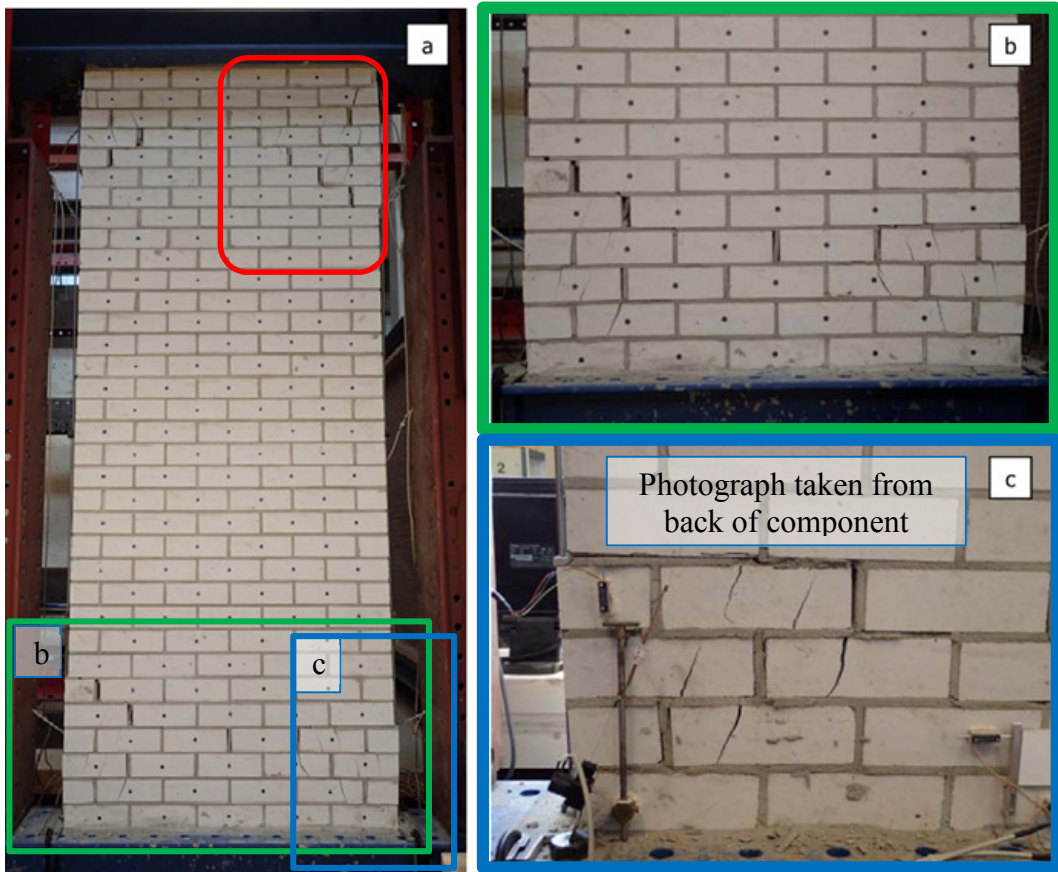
TUD-COMP-0a: Crack pattern at failure; general overview. Cracks in areas highlighted in red (a); detail of the bottom part of the wall (b) and of the toe crushing (c).
